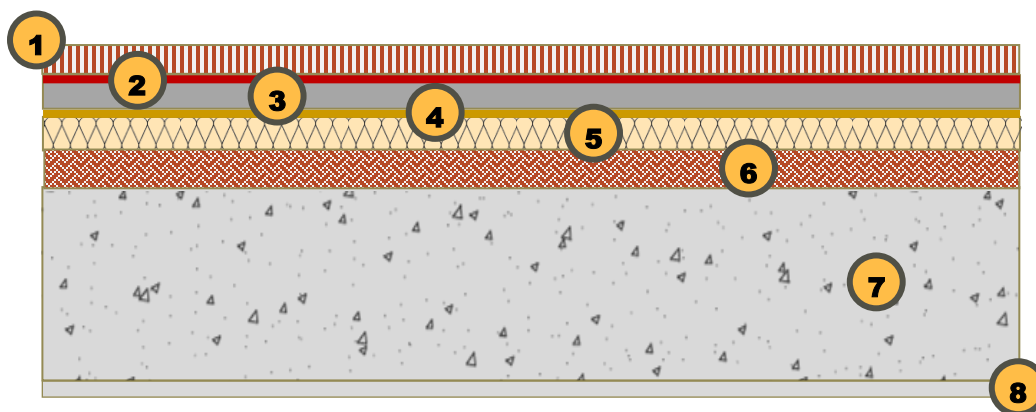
Construction detail for insulated (rigid insulation board – extruded polystyrene) slab - over deck
